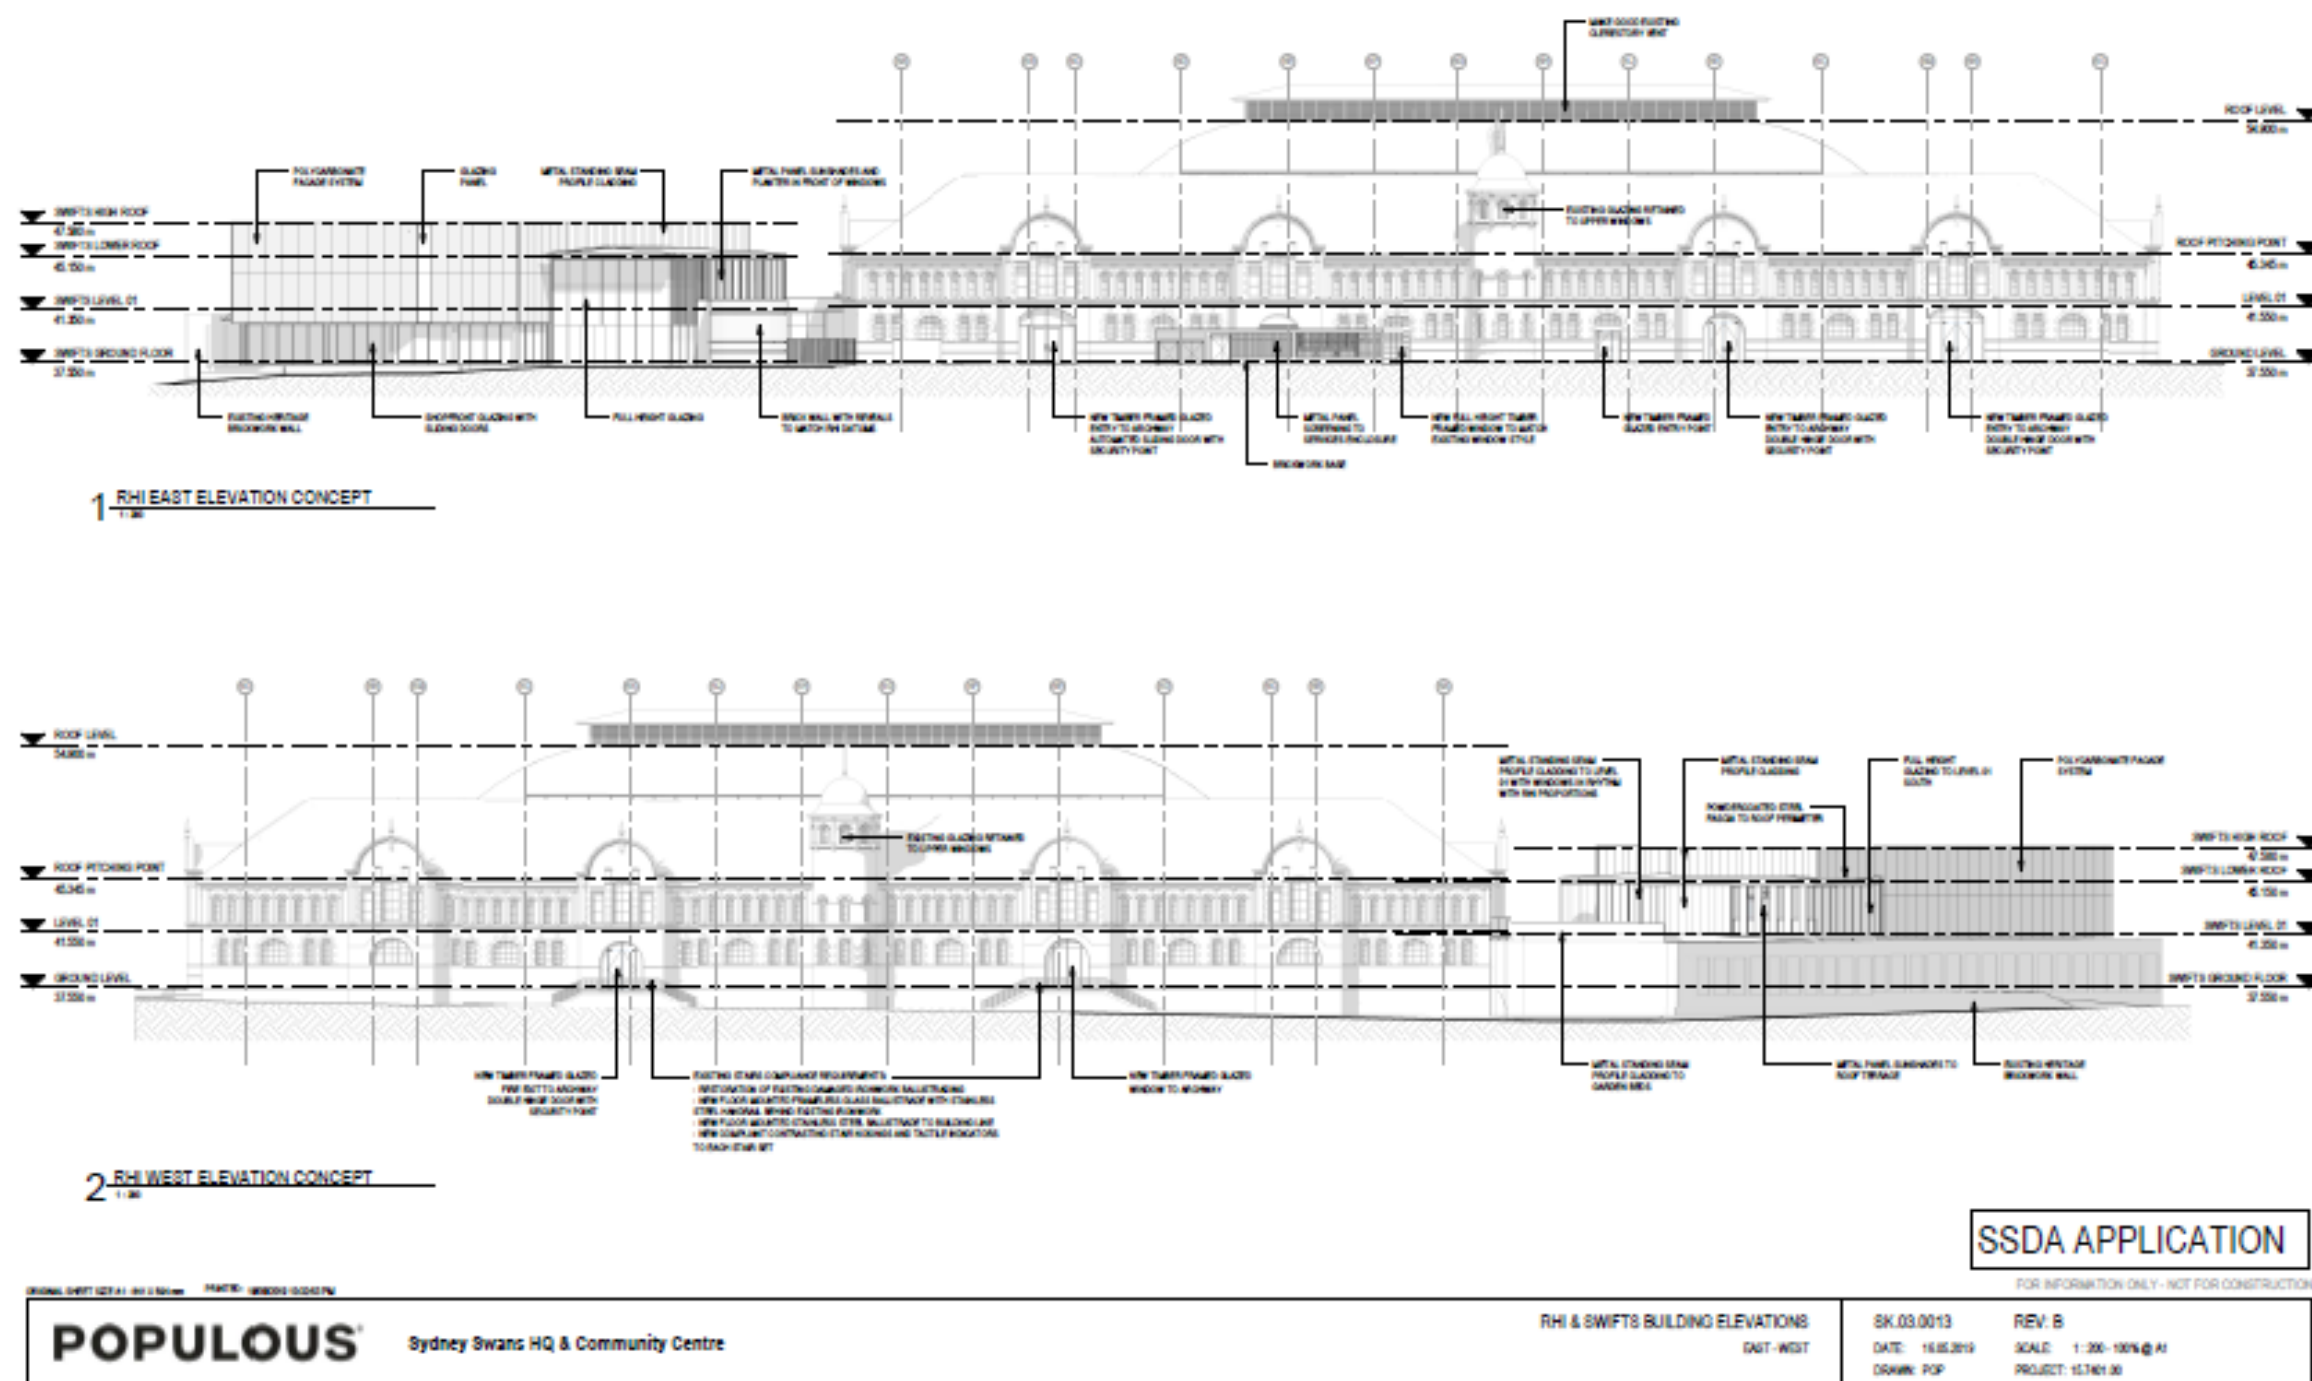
RHI & Swifts Building Elevations - East - West.
